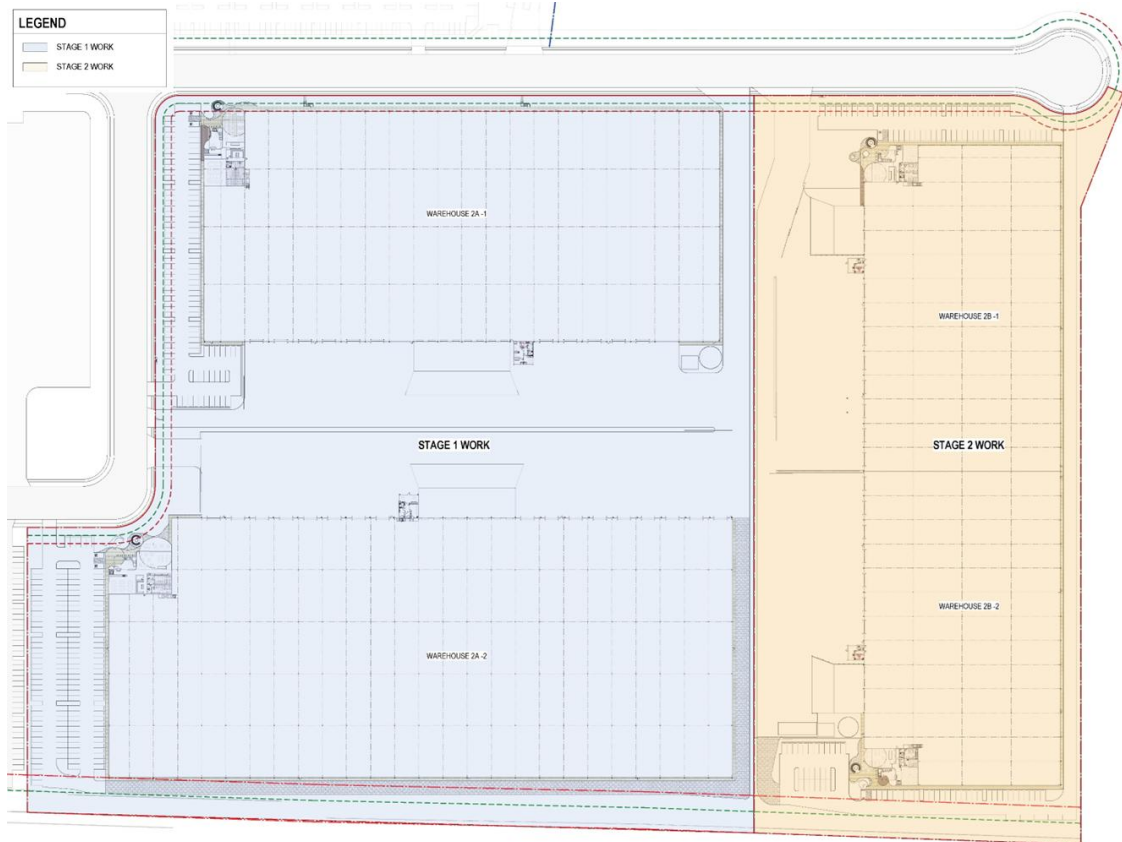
Proposed Staging Plan for Precinct 2 (Source: SBA Architects)
